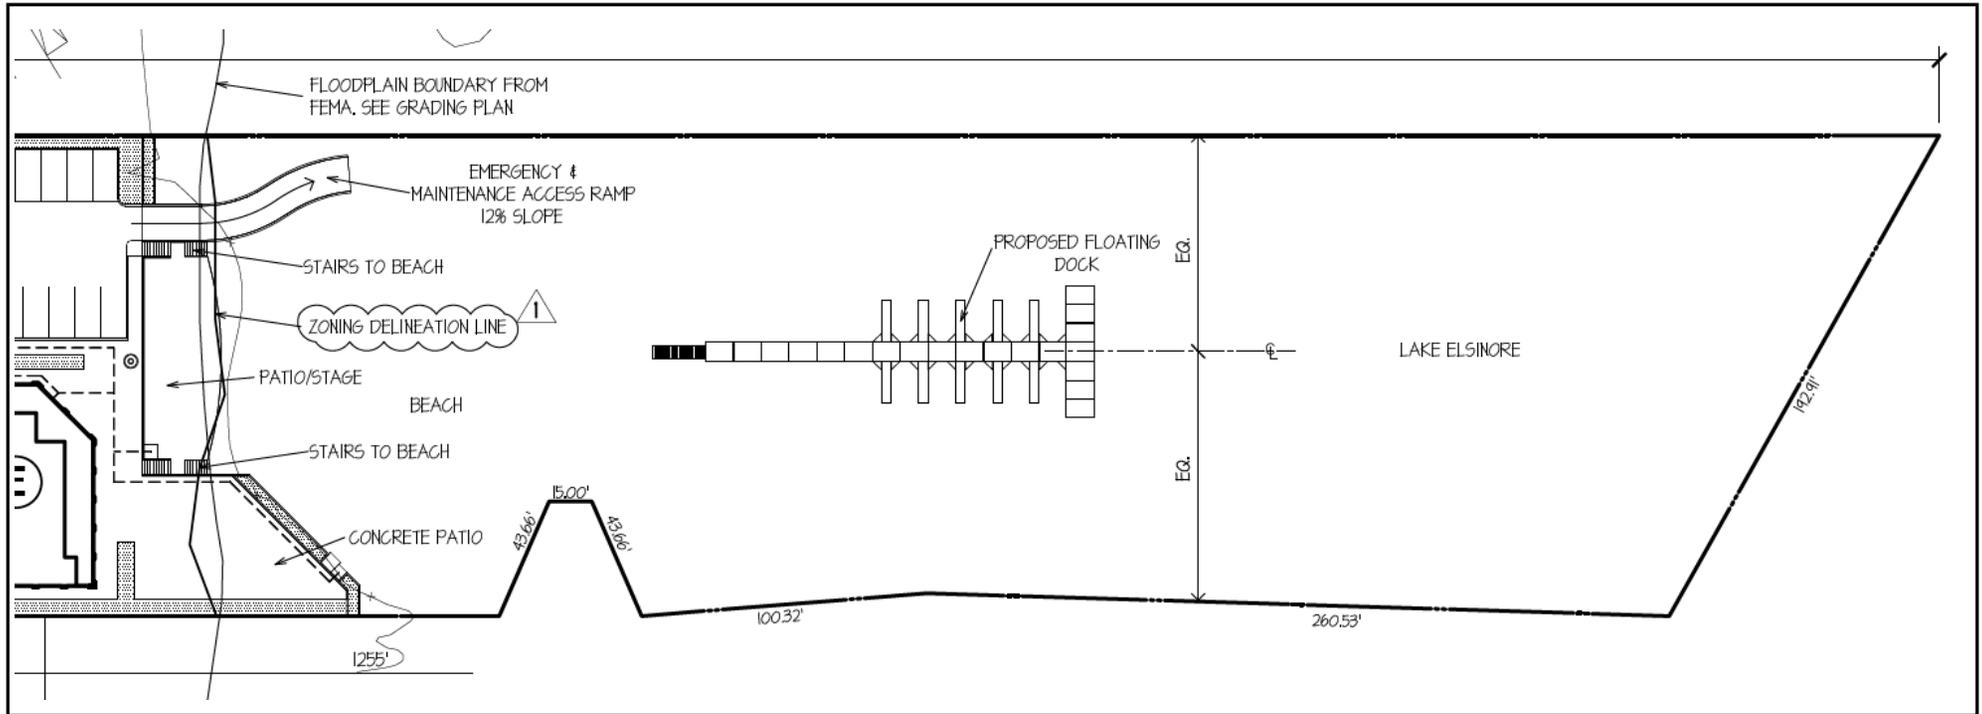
B – Site Plan - Beach Resort, Grand Avenue Fronting Portion
